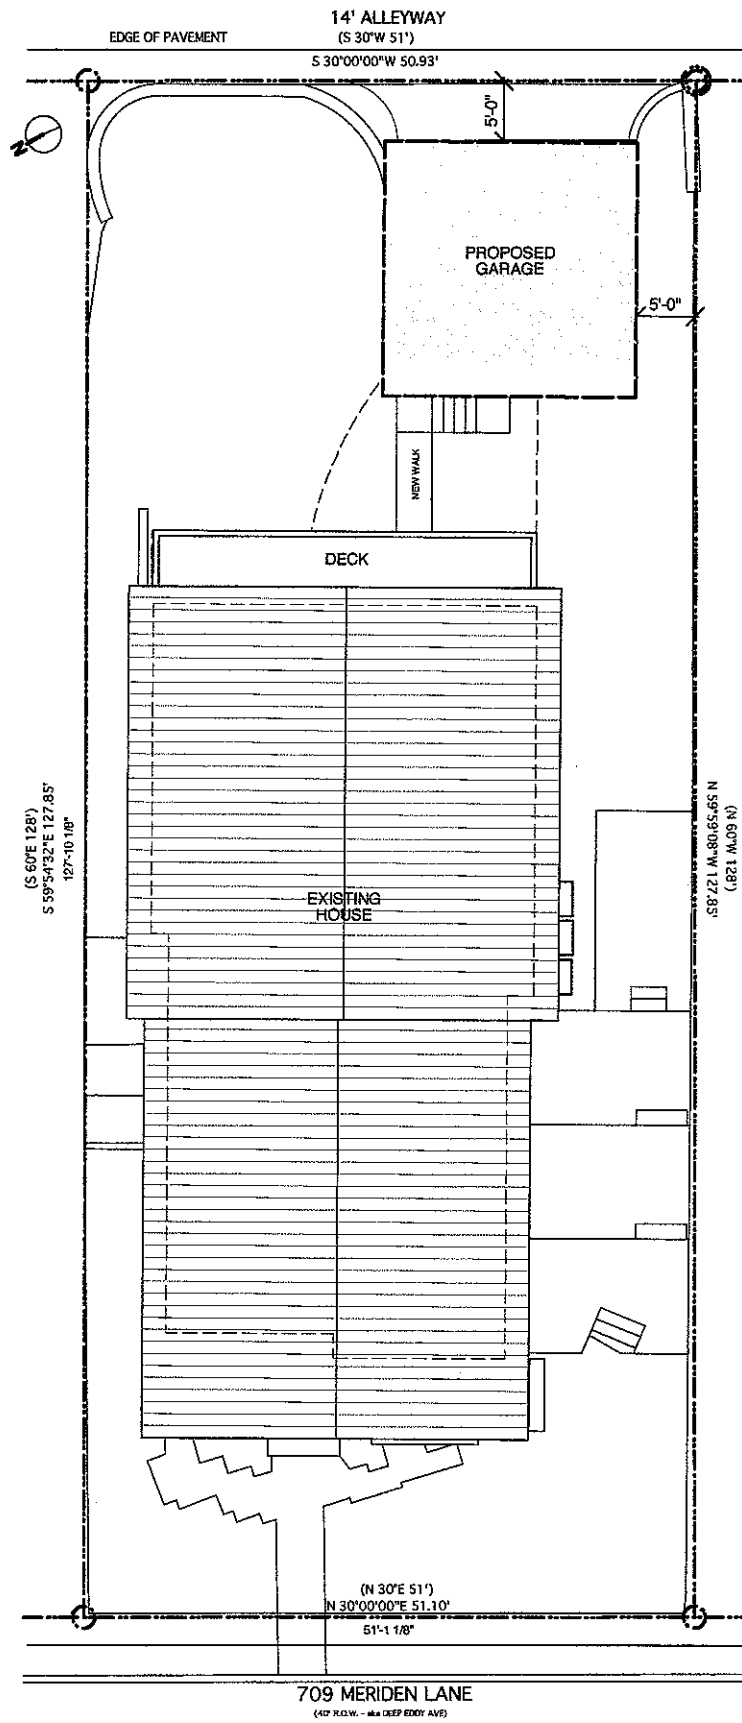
Proposed site plan. Scale: 1/6" = 1'-0
